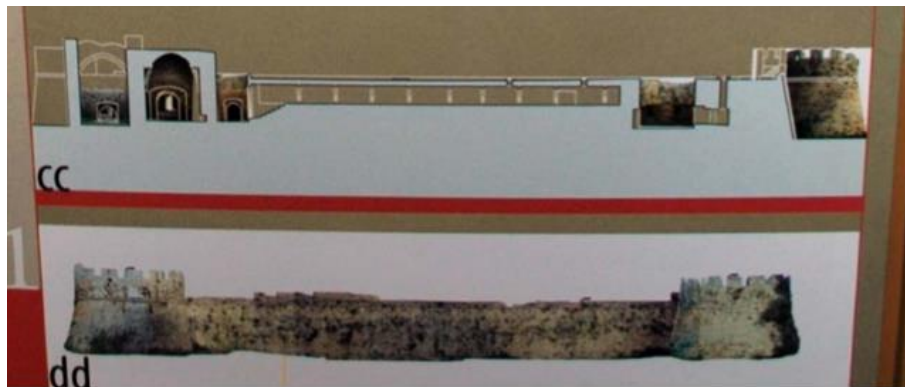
Sections and view from towers in Othello Tower, (UNDP-PFF, 2016)
